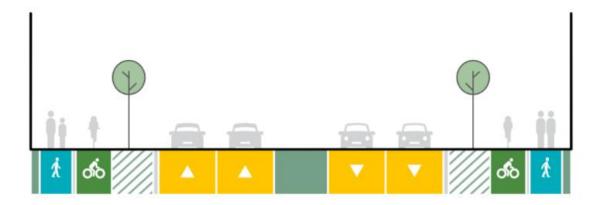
Indicative Access Road Upgrade cross section for urban section
